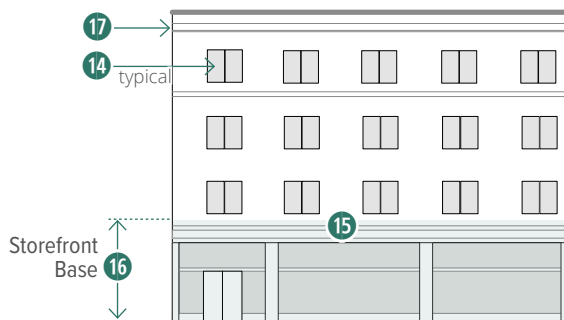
Storefront Building Section: Height & Use Requirements
